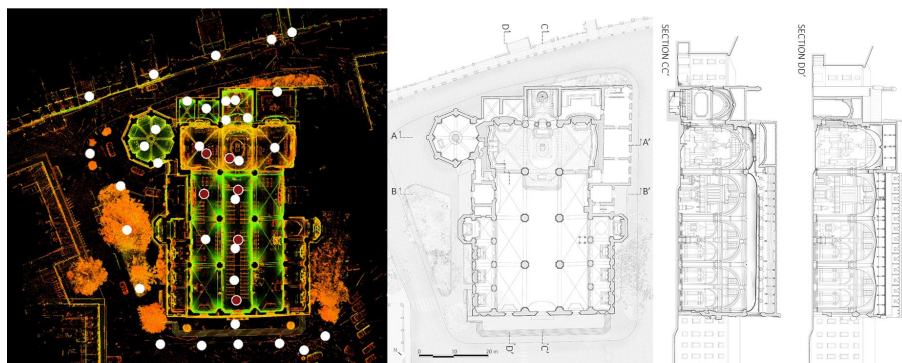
The survey campaign with TLS was carried out on the ground floor (white points) and in the attics (red points). 2D drawings of plans, elevations and sections were extracted from the point cloud. (Survey: L. Cipriani, G. Bertacchi); (CAD drawing: G. Bertacchi); (Editing: G. Bertacchi).
